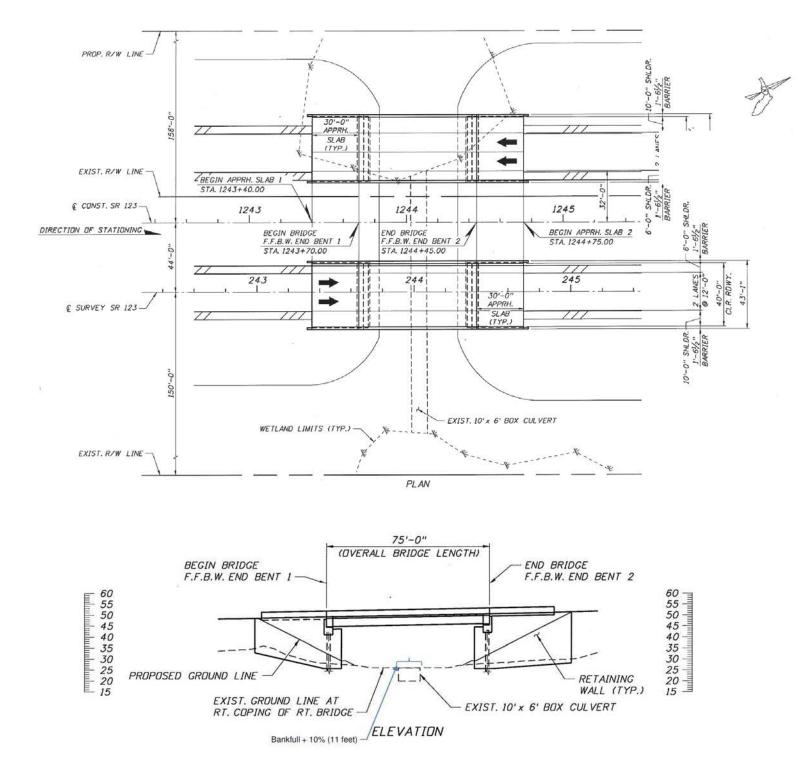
Preliminary Schematic of 75-Foot Single Span Bridge at Un-named Tributary
